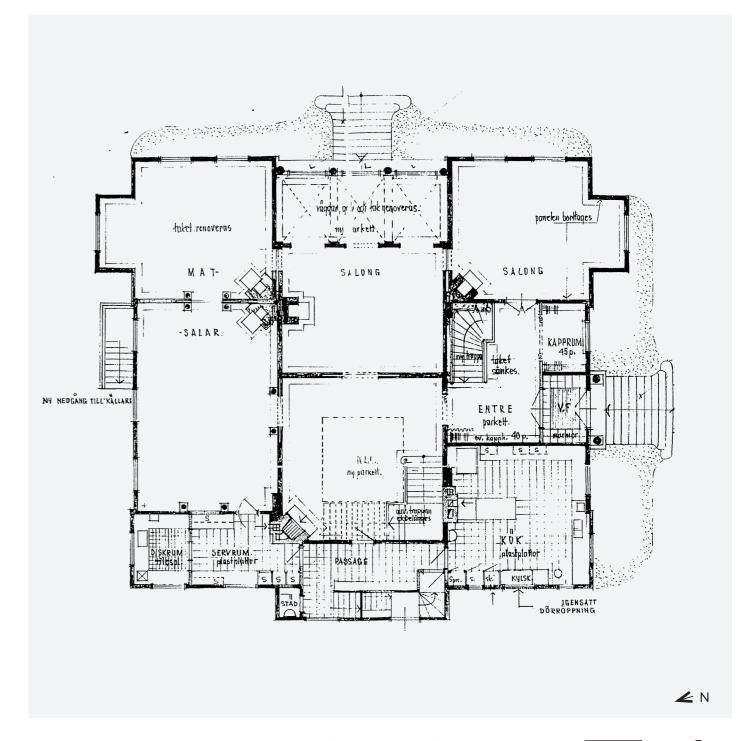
/ Slottsviken entrance floor plan drawing. (Unknown, 1952). CC PDM.
